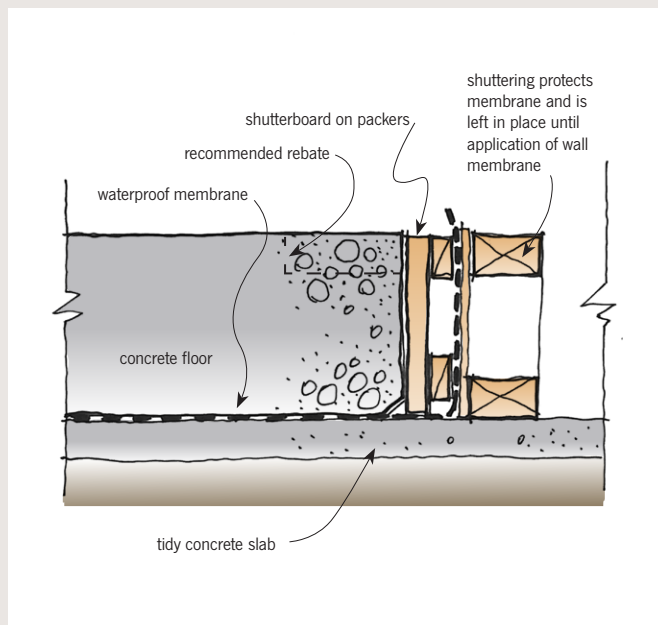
Suggested method of protecting sheet membrane at junction of floor and wall during construction.
